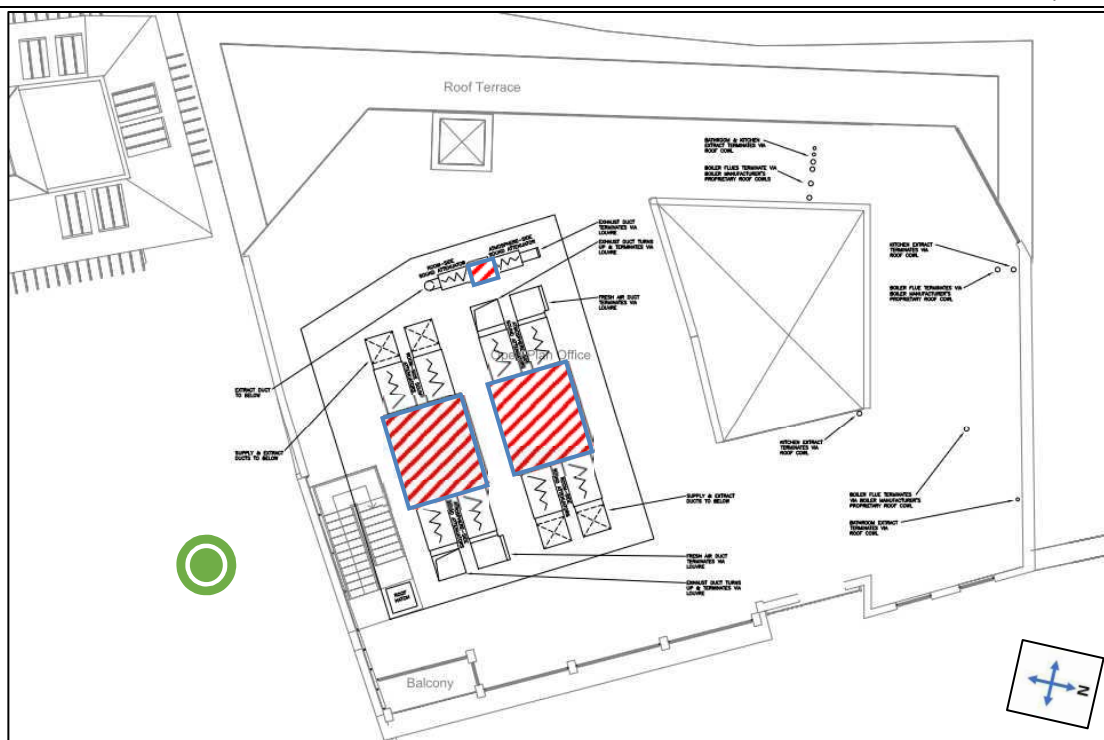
Proposed roof plan above new build extension (Image Source: Engine)
